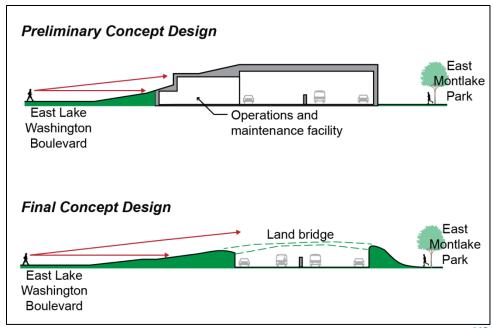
Conceptual section views of the Montlake Lid, looking west. 112
